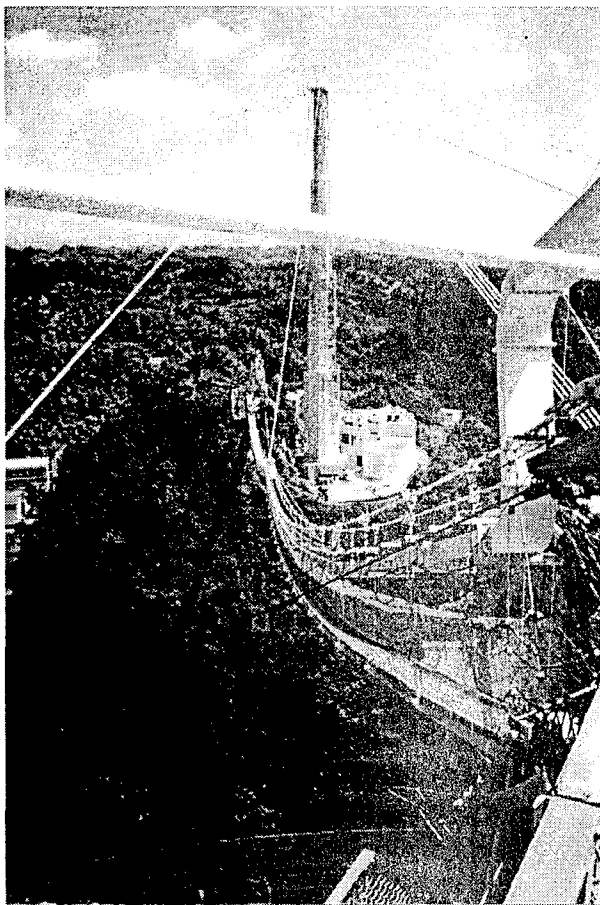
One of three reinforced concrete towers supporting antenna platform. The control building is visible at the lower left and the Visitor Center can be seen at the base of the tower.
